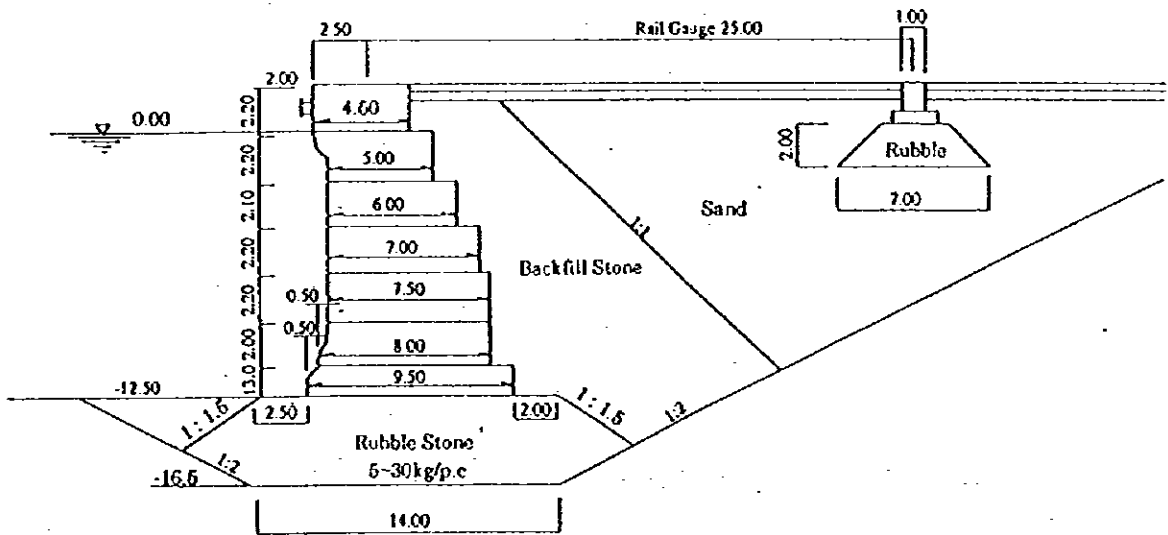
Typical Cross Section of (-)12 m Container Berth
